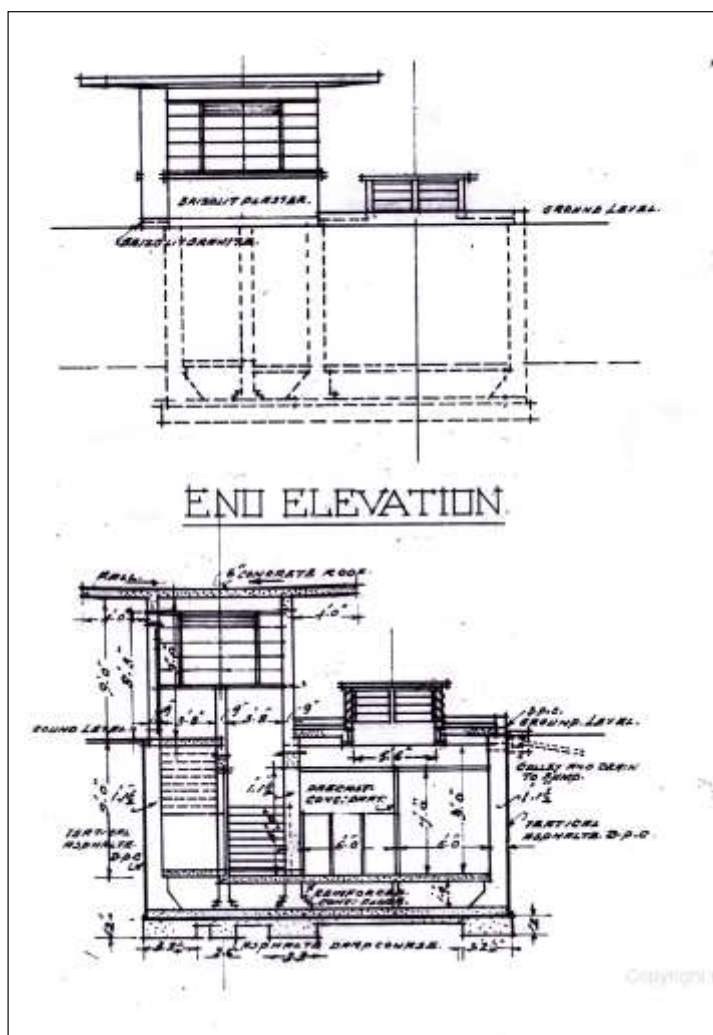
An extract from the design drawings for the Steine Gardens shelter shewing how it related to the underground lavatories and indicating the use of *Brizolit plaster* on the walls. It shews the overhang of the roof to be four feet. (ESRO)
